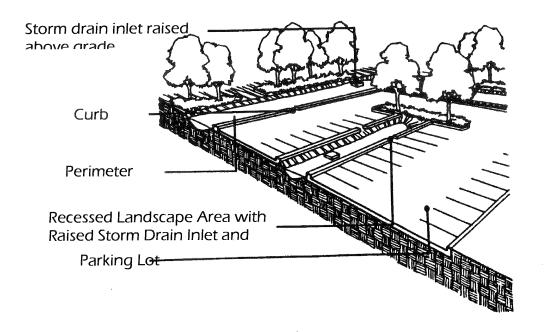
Figure F. Parking Lot Detention Schematic (Not a Standard Plan)
